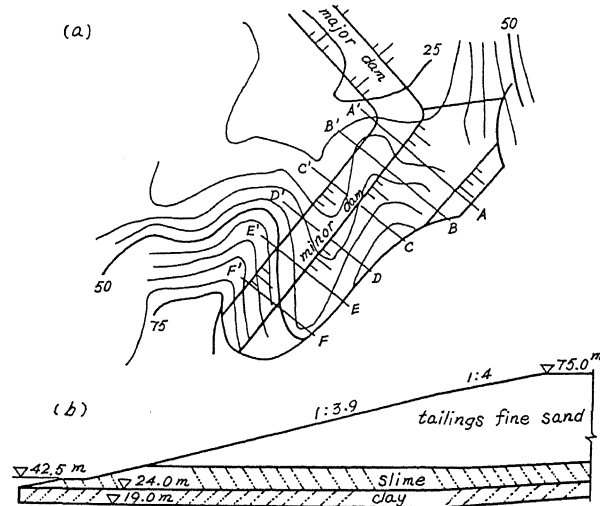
Tonling Minor Tailings Dam: (a) plan;
